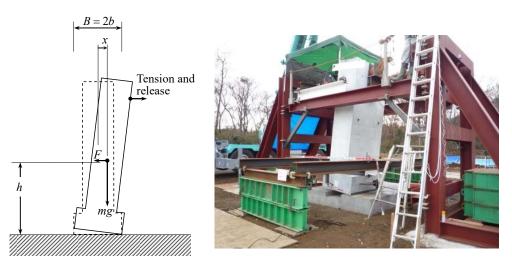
Rocking Specimen (Reinforced concrete column on concrete slab)
